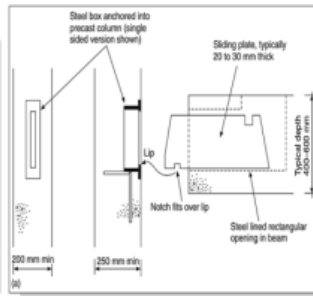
Sliding plate beam-to-column hidden connection in detail.
